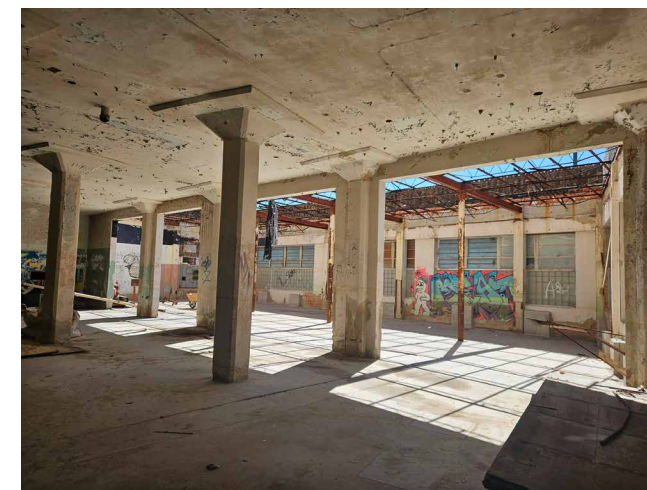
E Commerce Friedrich Building Uncovered Space Along Southern Exterior Wall Facing E Commerce St
